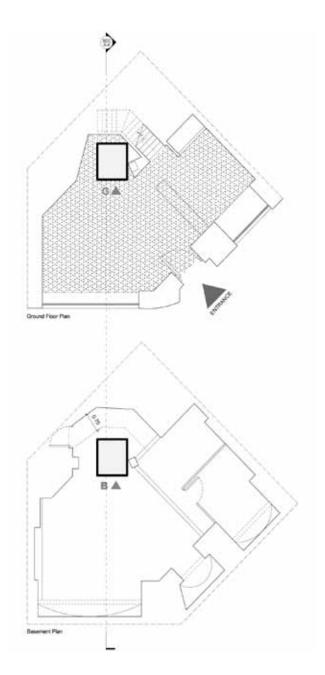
Plans outlining the proposed use of space. There are just two main spaces within the commercial property, the shop floor and the basement storeroom. Access between the two currently requires our client to walk around his premises to the entrance around the back. Because of this we propose to fit a lift spanning between the basement and ground floors, which our client could use to carry heavy goods and stock between the two levels. The design of the lift is respectful to its surroundings, being made to the most part out of glass, reflecting the large shop windows situated opposite and remaining unobtrusive as a result. The placement of the lift remains so to as not be over visible from outside the shop unit, only becoming apparent when looking through the window on Leather Lane. The lift also complies with all regulations regarding fire safety. Our clients desires to remain part of the community in which they reside but feels that the current situation, regarding access to their basement, is proving to be detrimental to their business.
